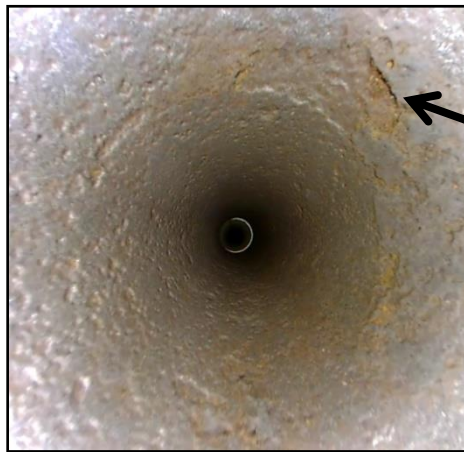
Video inspection of cleaned pipe showing corrosion defect
